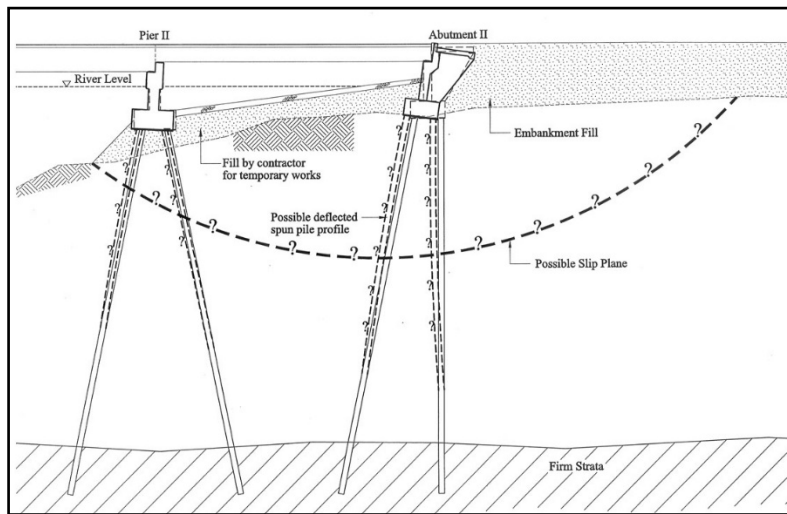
Schematic of slip failure of bridge foundation and the approach to a bridge [8]
